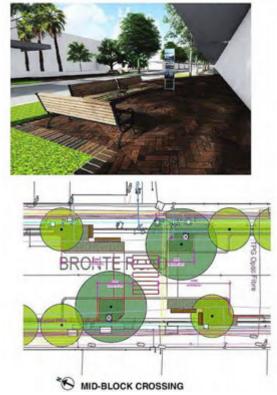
Proposed design and arrangement of street furniture and heritage panels (Source: EP, 2023)
